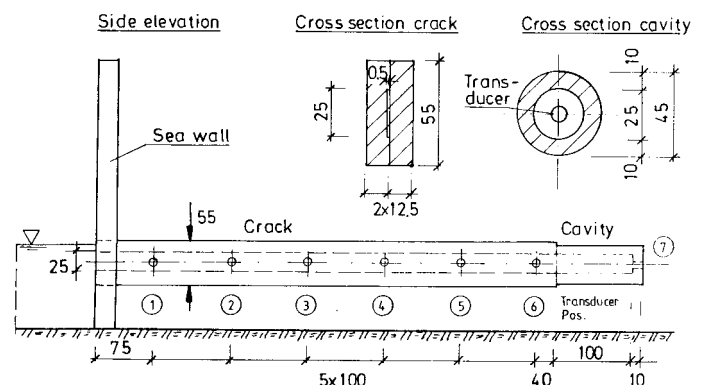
600mm crack model and cavity (all dimensions in mm)
